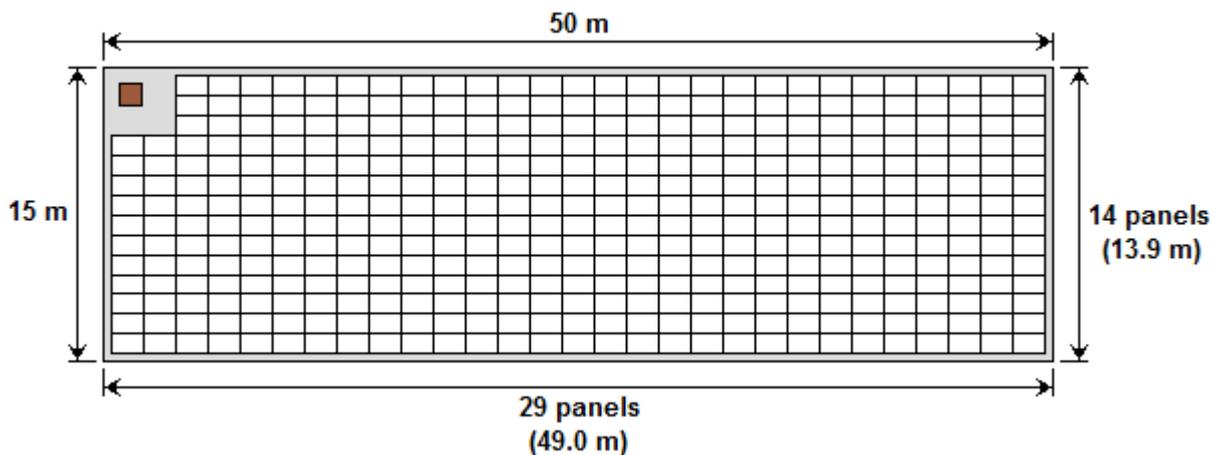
PV panels installed on the roof of the office building nZEB scenarios.
